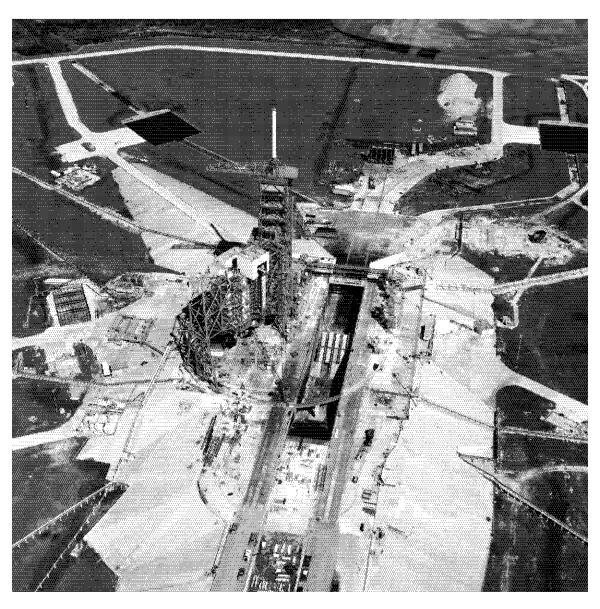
Aerial view of construction work at LC39A, October 15, 1977. Source: John F. Kennedy Space Center Archives, 108-KSC-377C-626 Frame 48.
